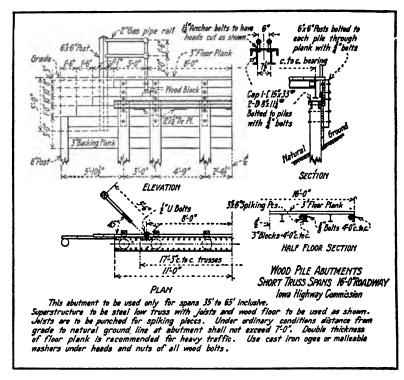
TIMBER PILE ABUTMENT FOR STEEL HIGHWAY BRIDGES. IOWA HIGHWAY COMMISSION.
